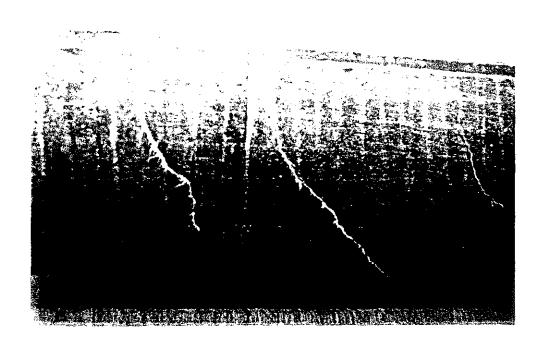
Class AA concrete bridge deck as viewed from beneath the deck (Span 2 of I-75 southbound over 12^{th} Street).
